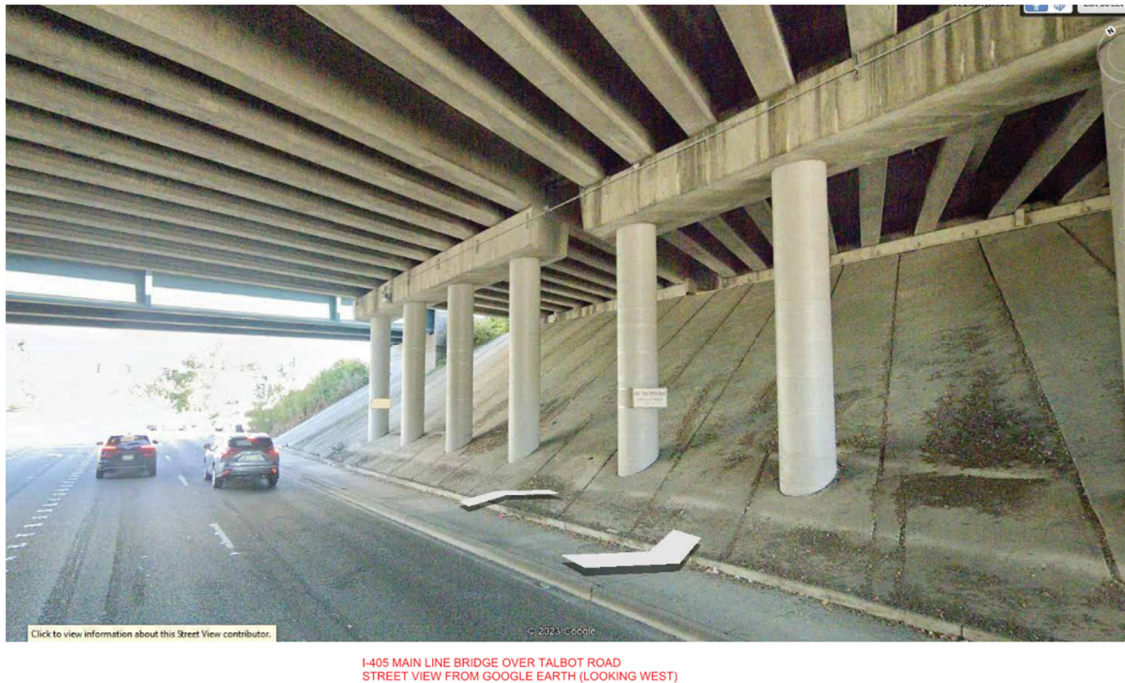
I-405 Mainline Bridge Over Talbot Road
